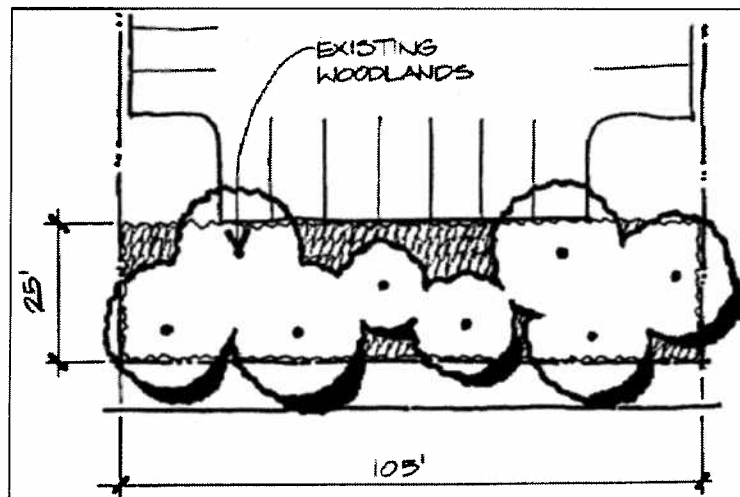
Parking Lot Landscaped Strip, Option 5
